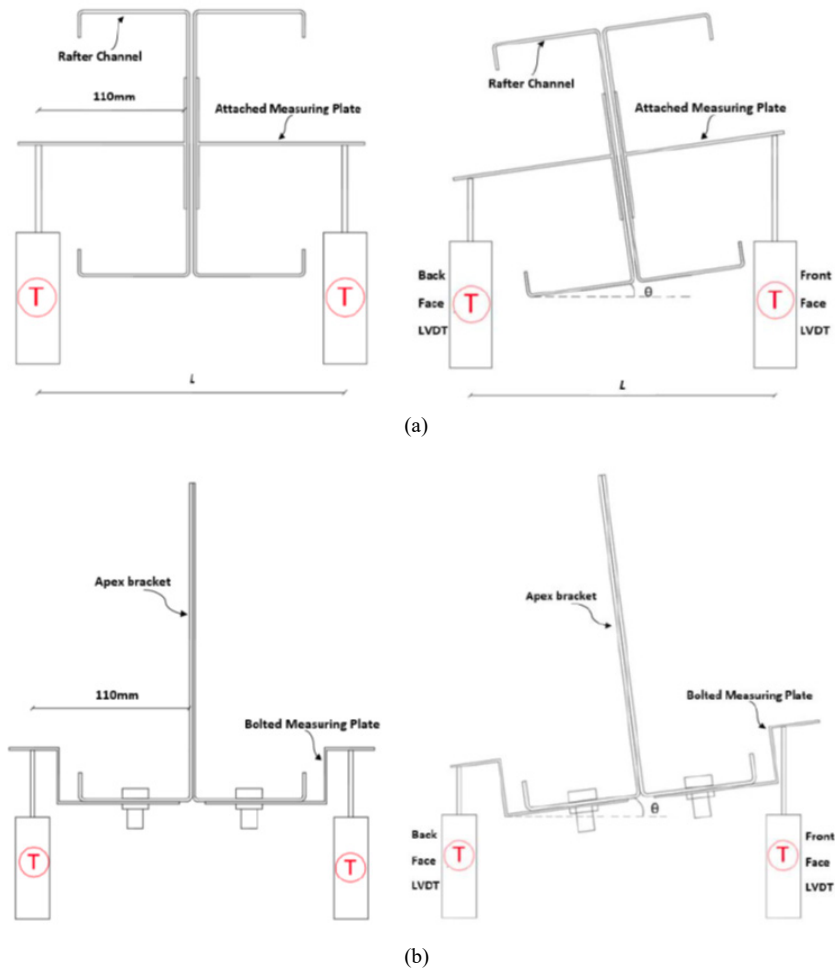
Vertical LVDTs used for measuring the specimen out-of-plane rotation (a) at the rafters and (b) at the apex bracket
